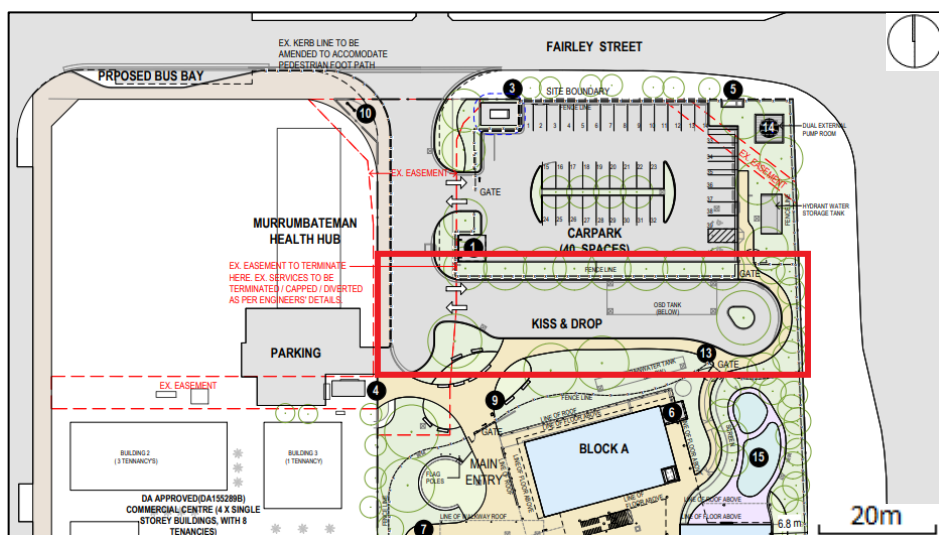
| Drop-off/pick-up facility (Base source: Applicant's RtS 2021)
